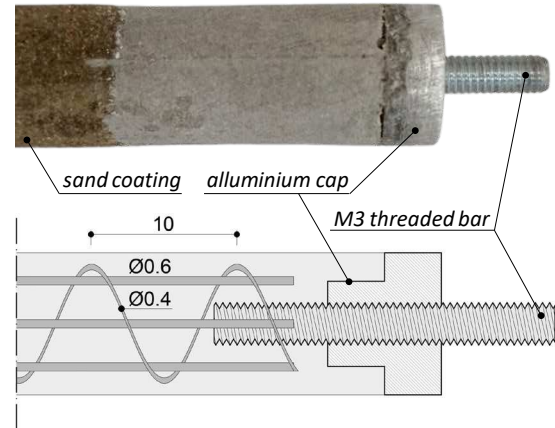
RC piles longitudinal section; dimensions are given in mm.
